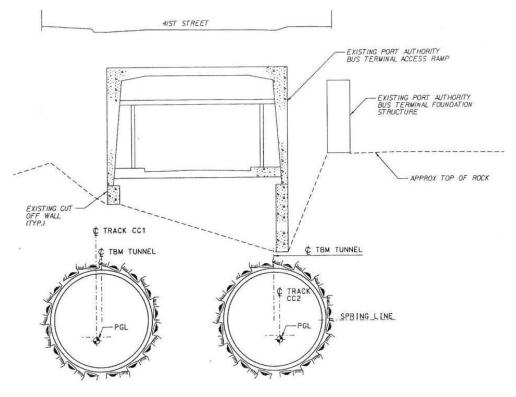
Cross section of final tunnel drive beneath PABT foundations.
